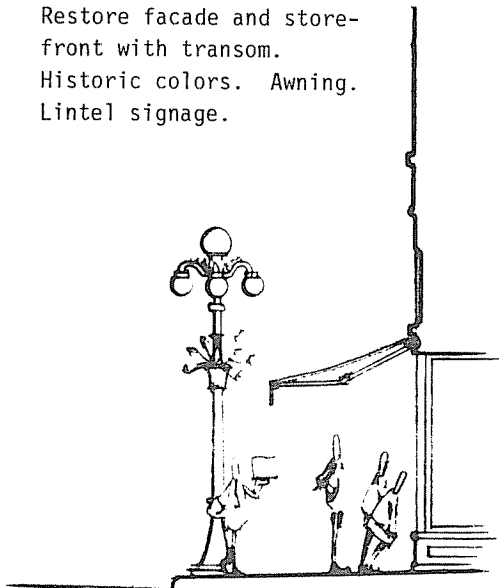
Proposed 17 S. Broadway, Pitcher Building
